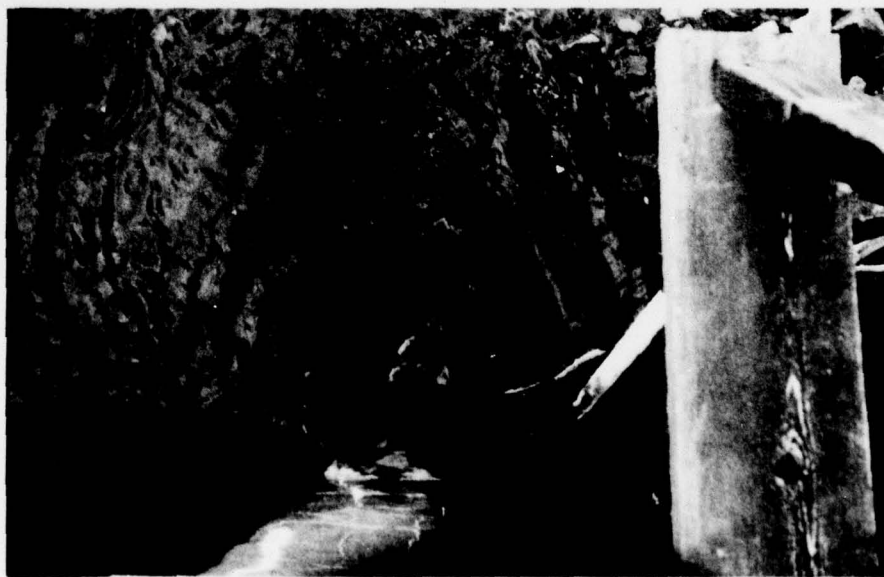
FLOW OUT OF SLUICE TUNNEL
